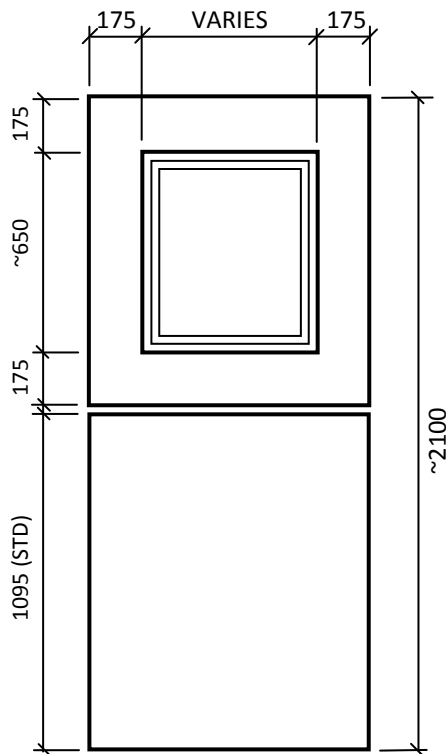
DOOR STYLES – EXAMPLES OF APPLICATION PART 1
